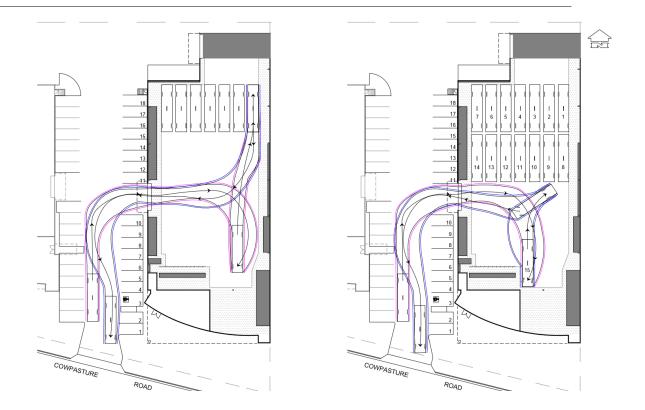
Truck Parking, Layout and Manoeuvrability at Unit 2, 103 Cowpasture Rd
